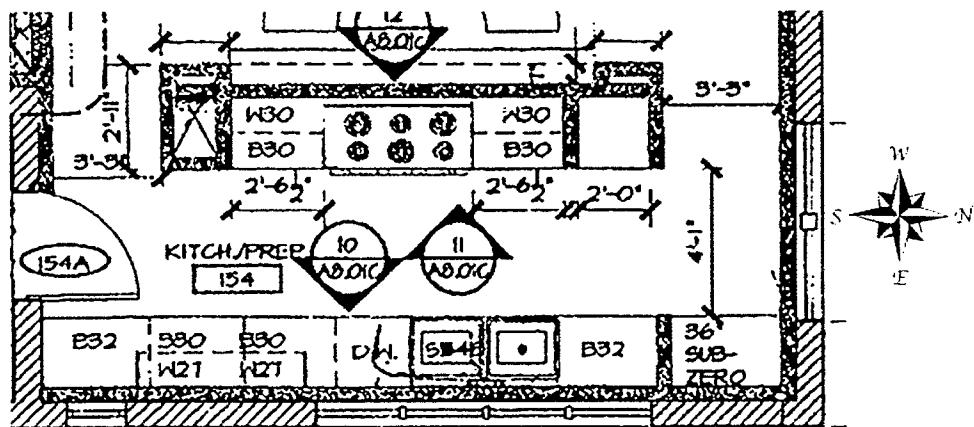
Enlargement of kitchen area of first floor from bottom right hand corner of Figure 2. Kitchen sink is centered in front of the large kitchen window located on the east wall of the carriage house. The installed kitchen sink was a single basin sink, contrary to what is shown in the drawing.
